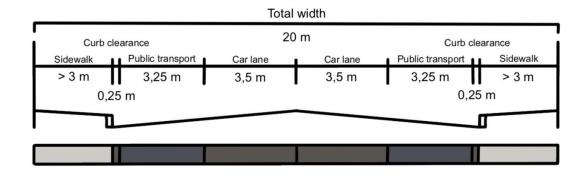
A suggested cross-section for Elgeseter Street, with car lanes, public transport lanes, and sidewalks. (Made by: Susanna Hsu Hals)
